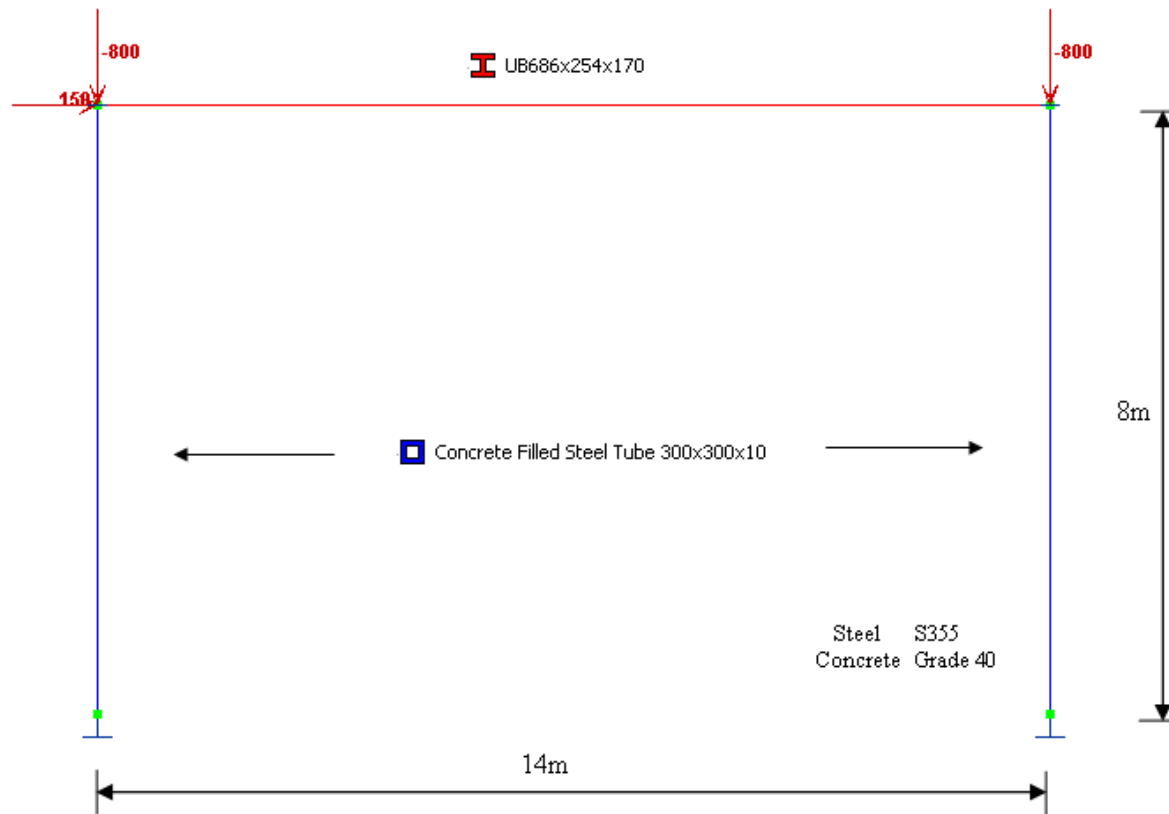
Layout of the Portal Frame with Composite Columns and Steel Beam
